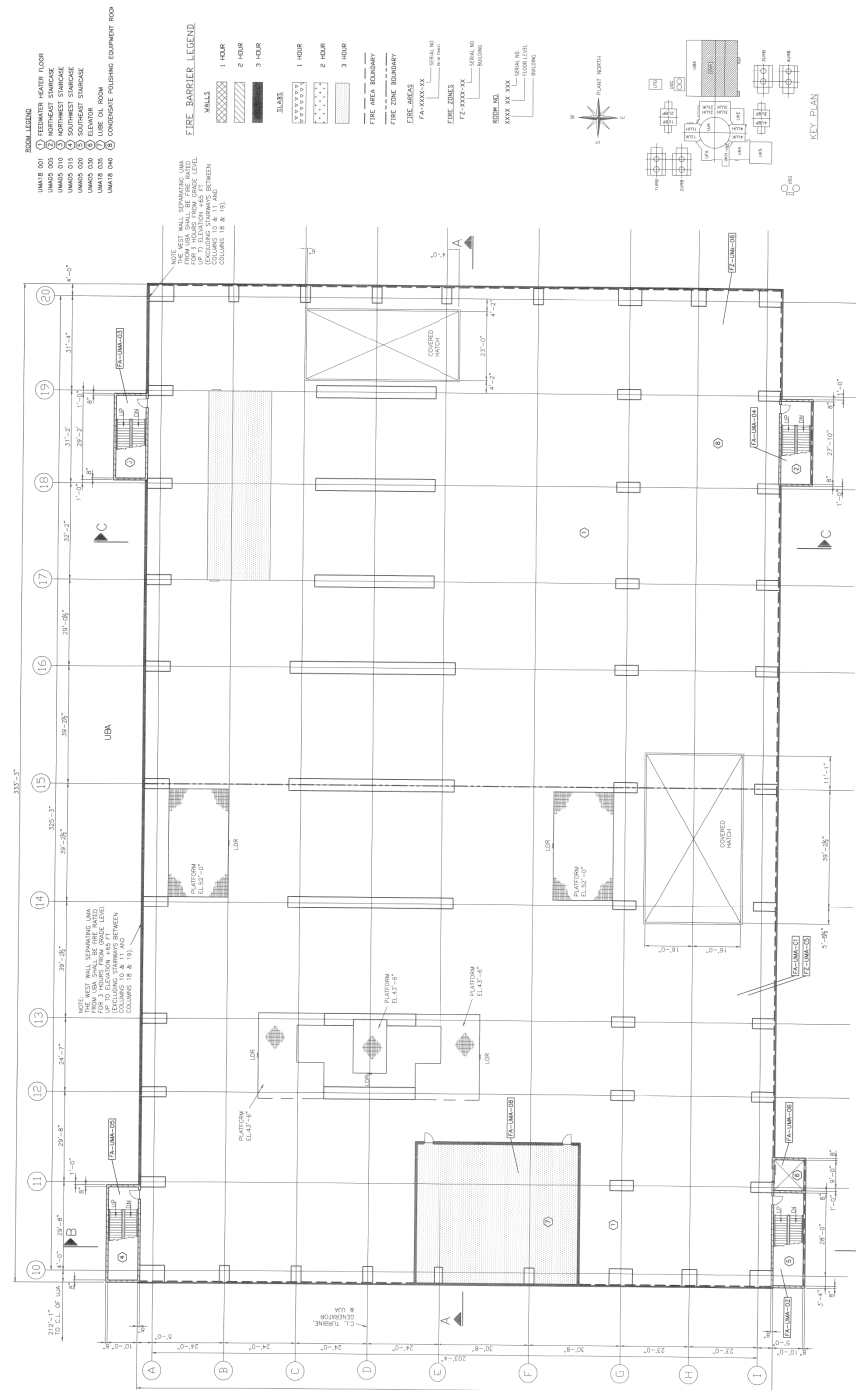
B-4— {CCNPP Unit 3 Fire Barrier Location, Turbine Building Plan at Elevation +65 Feet}
